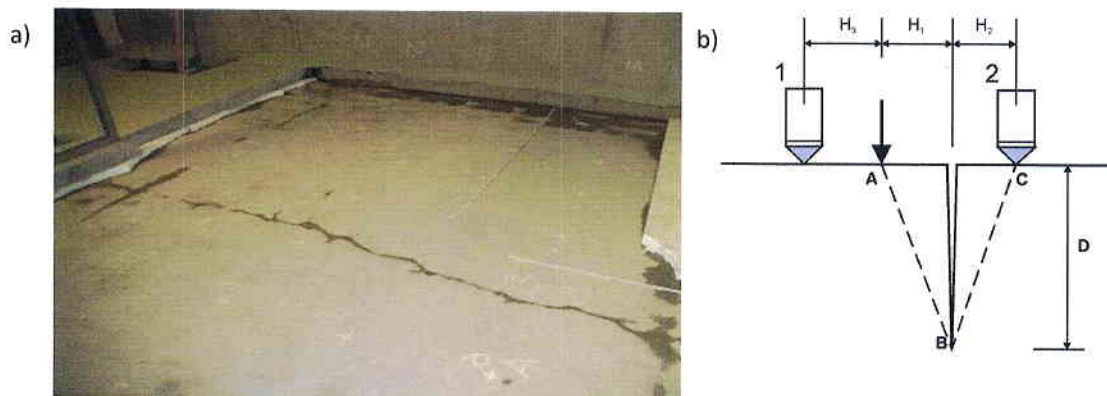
Illustration of material imperfection – crack: a) view of cracked foundation slab, b) schematic showing how crack depth is determined.
